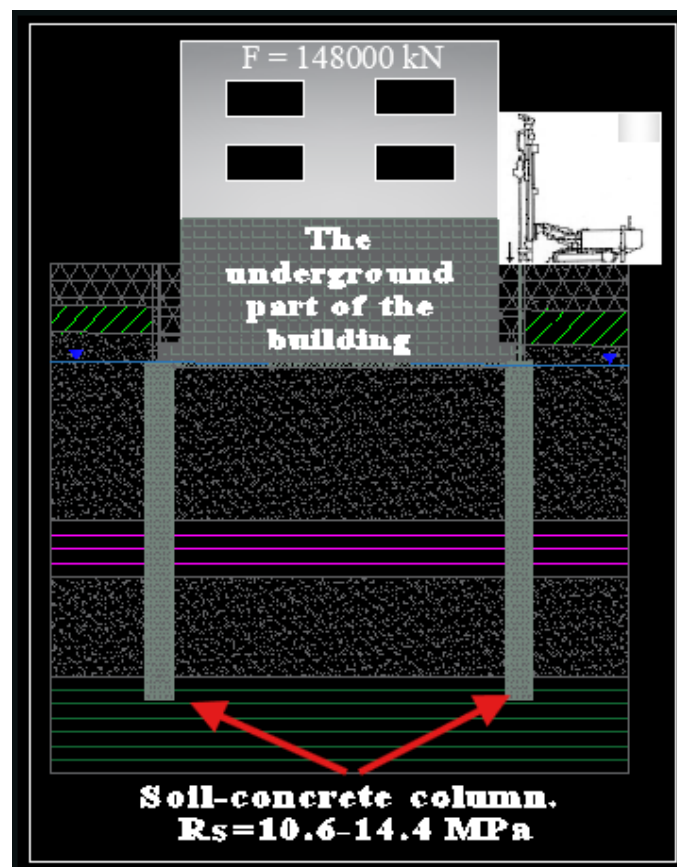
Construction of soil-concrete columns using Jet Grouting technology. The section along line B-B
